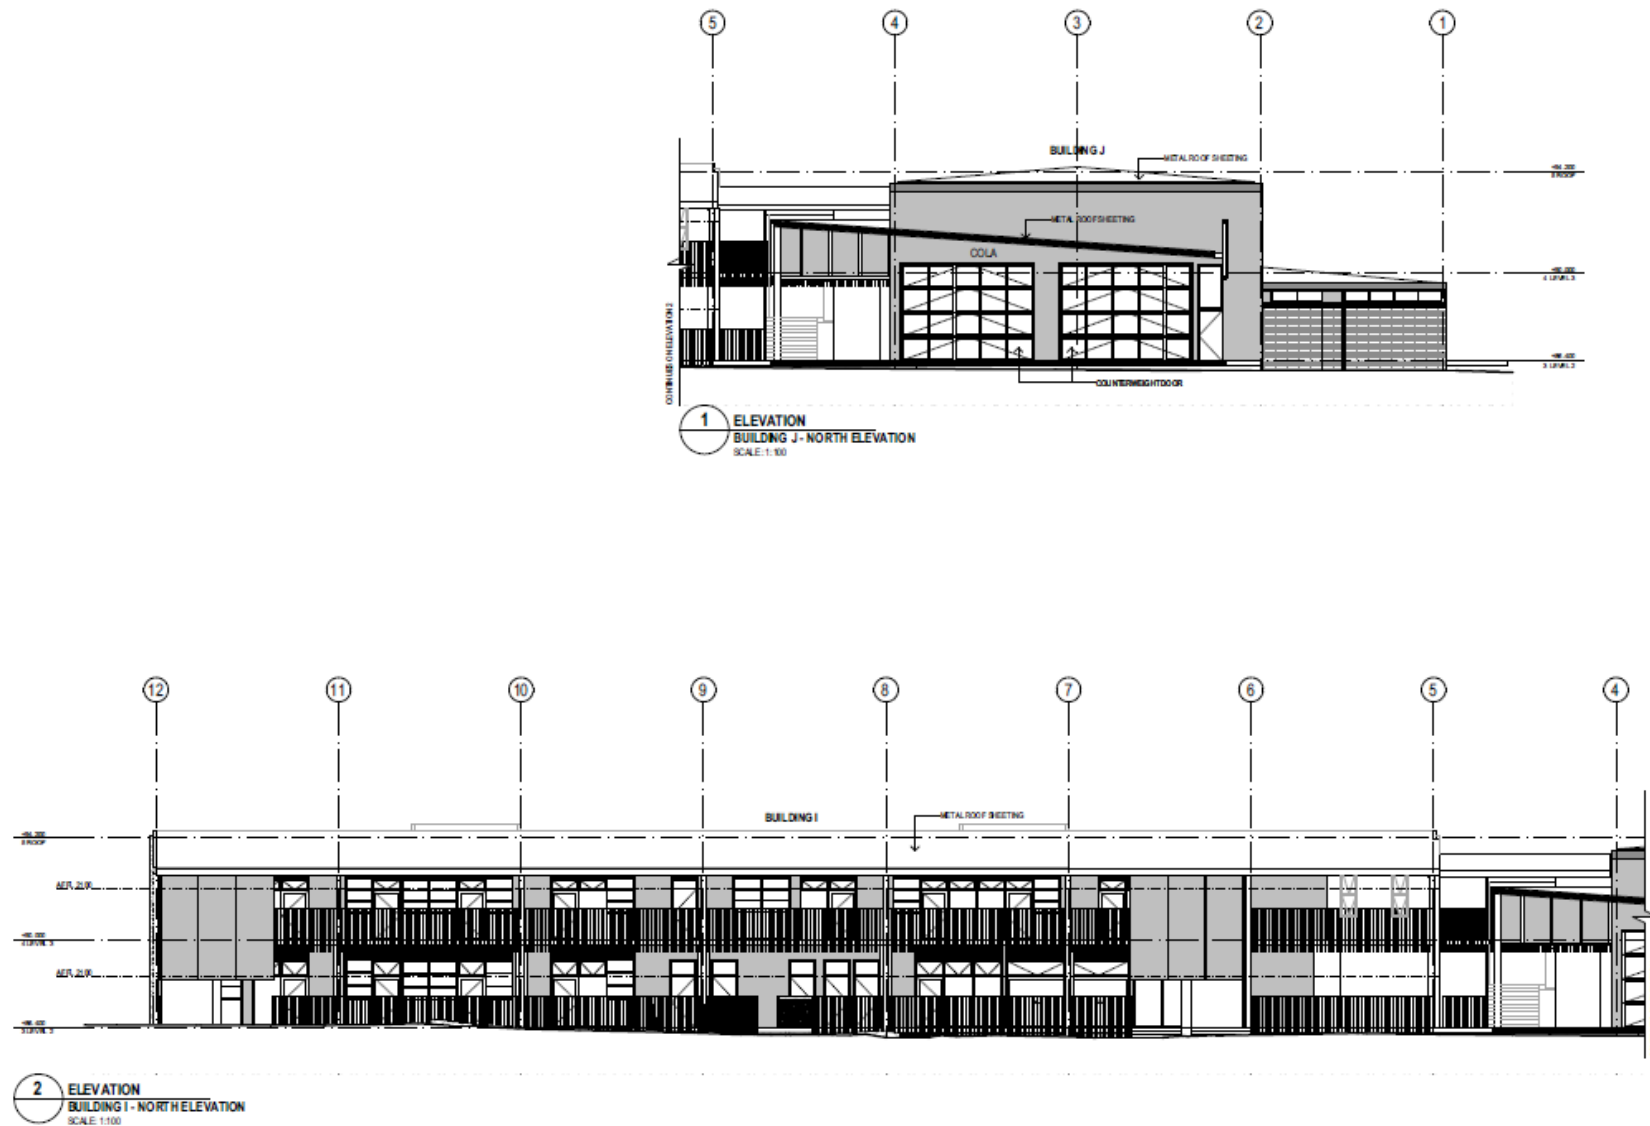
Proposed Building J and I North Elevations. Source: Fulton Trotter, 2021
